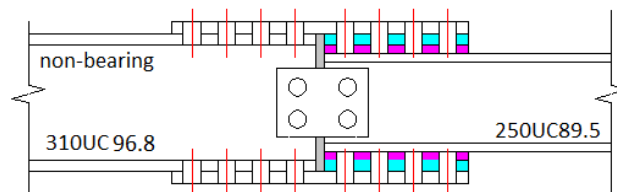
Schematic view of Specimen #6, (Non-bearing with 10mm gap, 2x12mm fillers, 12mm flange plates)
